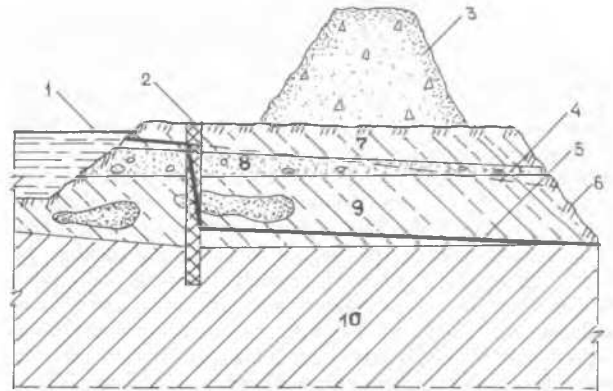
Protection against ground water of the open pit Inguletsky Mining and Dressing Combine (schematic view)
